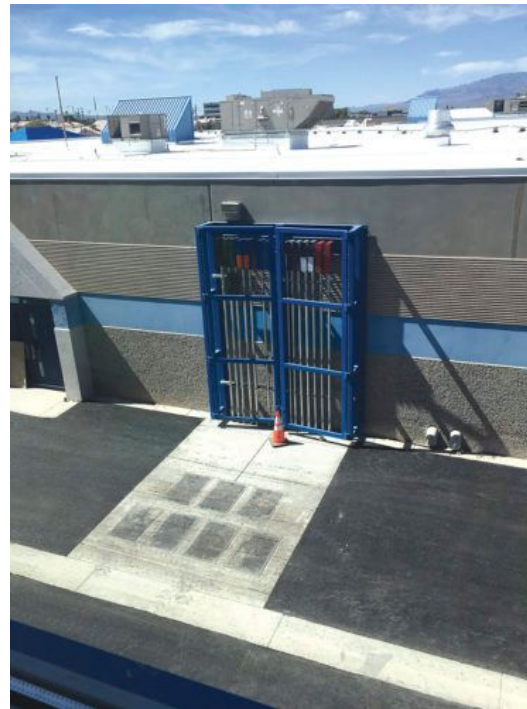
This installation shows a structural cage that has been constructed to add protection to the conduit. This installation is within a fire lane for an educational facility and fine metal mesh will be added to the installation to prevent access to the interior of the conduit cage when the hinged doors are closed and locked. Additionally, the existing building footing was compromised during excavation and a structural cage was required around the conduit to add structural integrity of the exterior wall.
